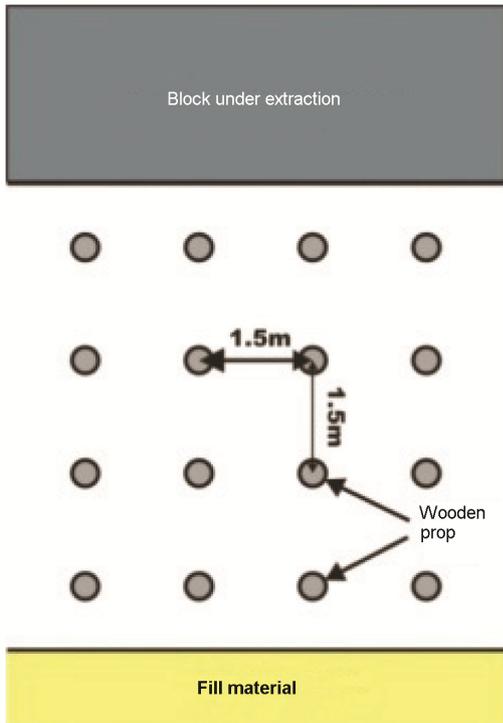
Plan view of the proposed support pattern for reinforcing the stope back.
